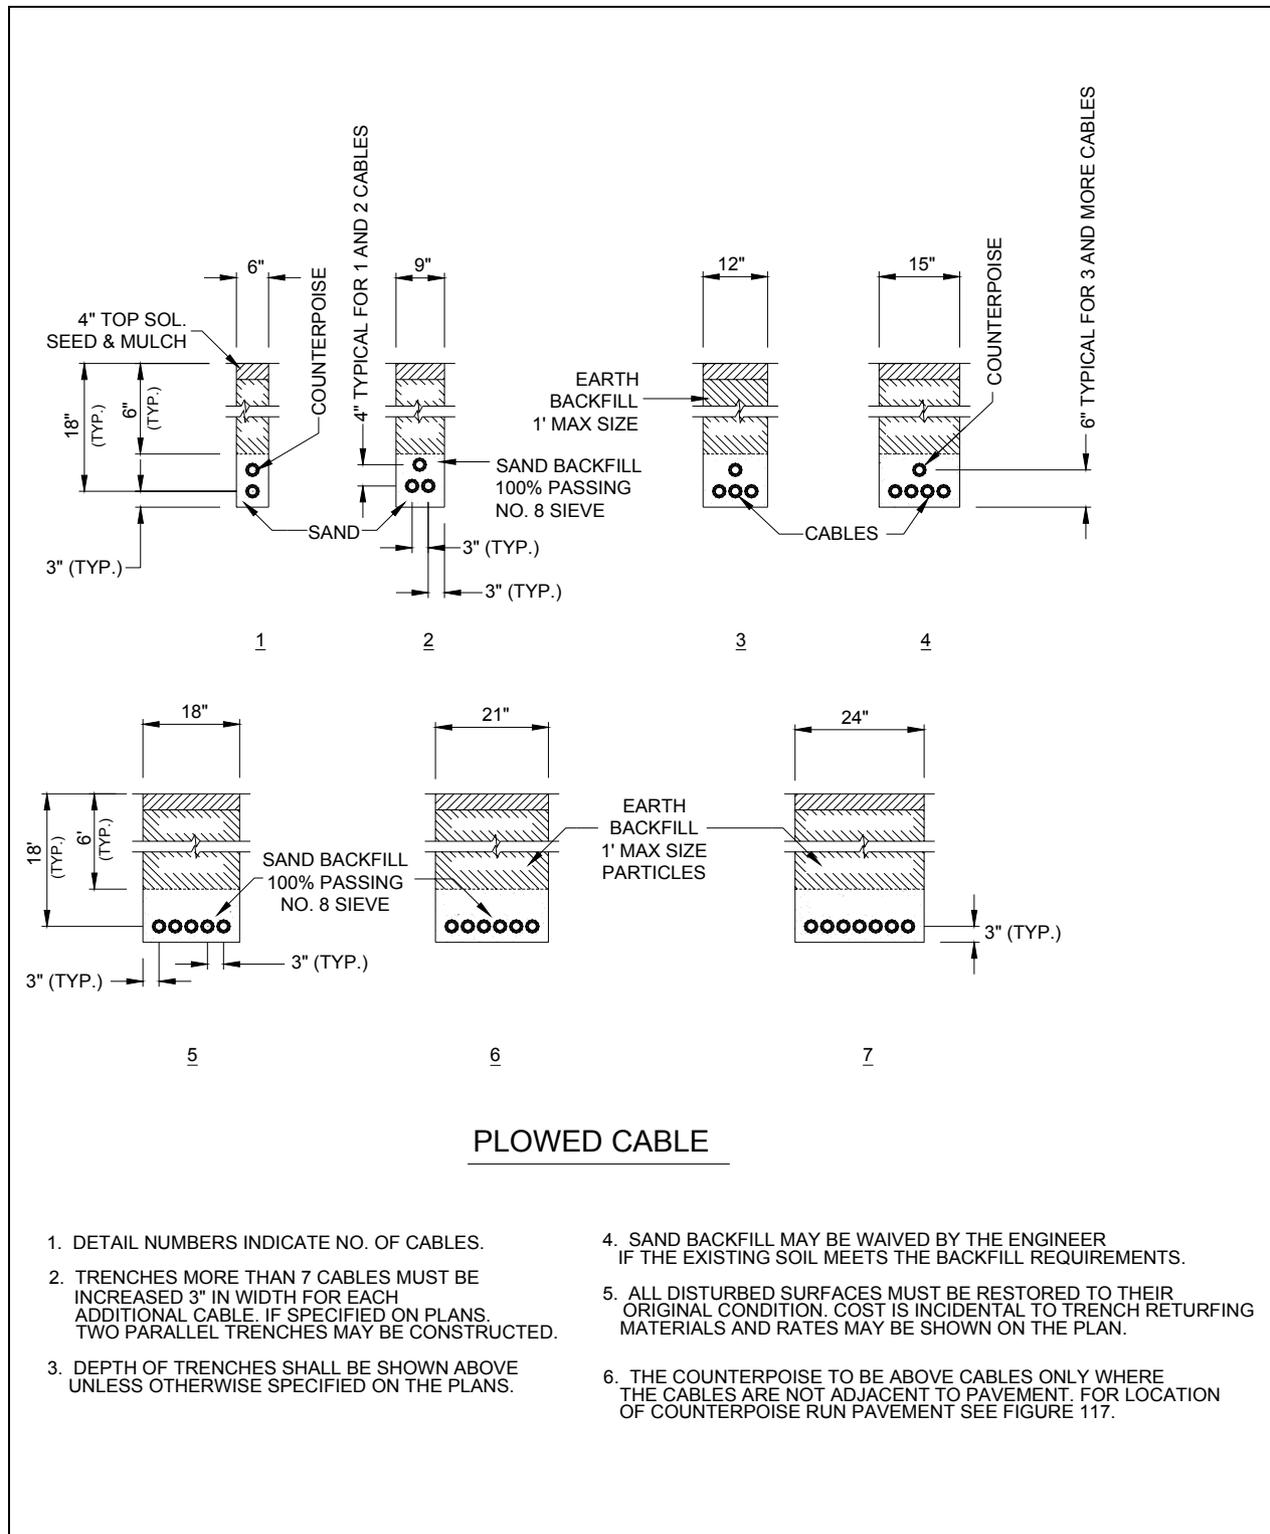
Standard Details for Underground Cable Installation –Plowed Cable
